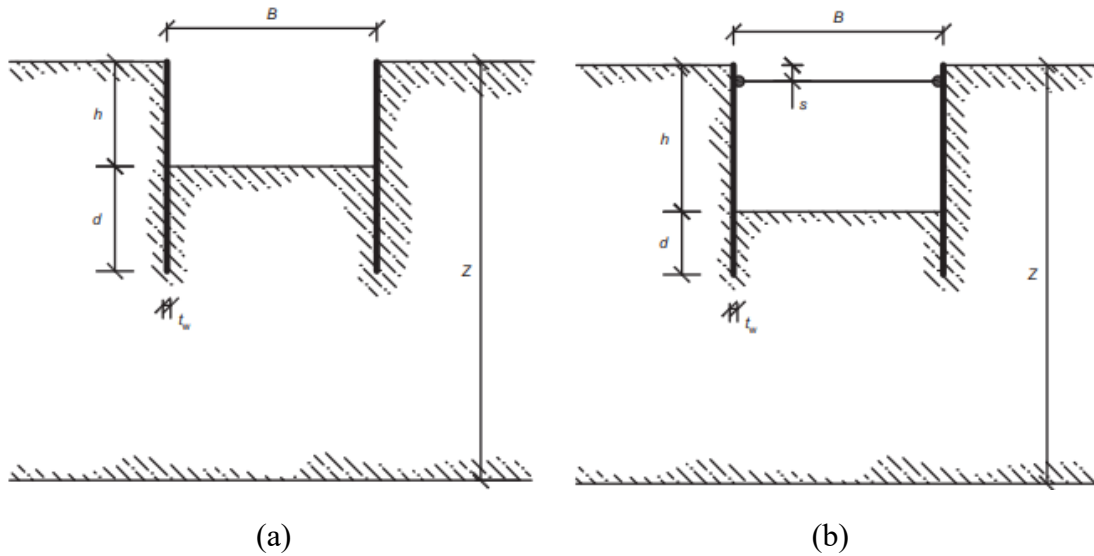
Geometry of the centrifuge model (a) cantilever retaining wall (b) propped retaining wall.
